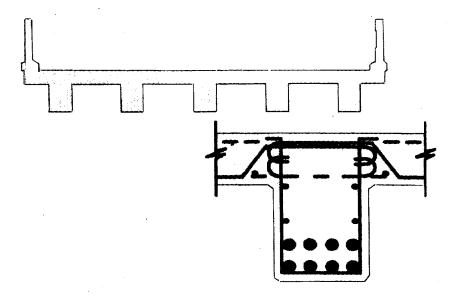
Steel Reinforcement in a Concrete Tee Beam
